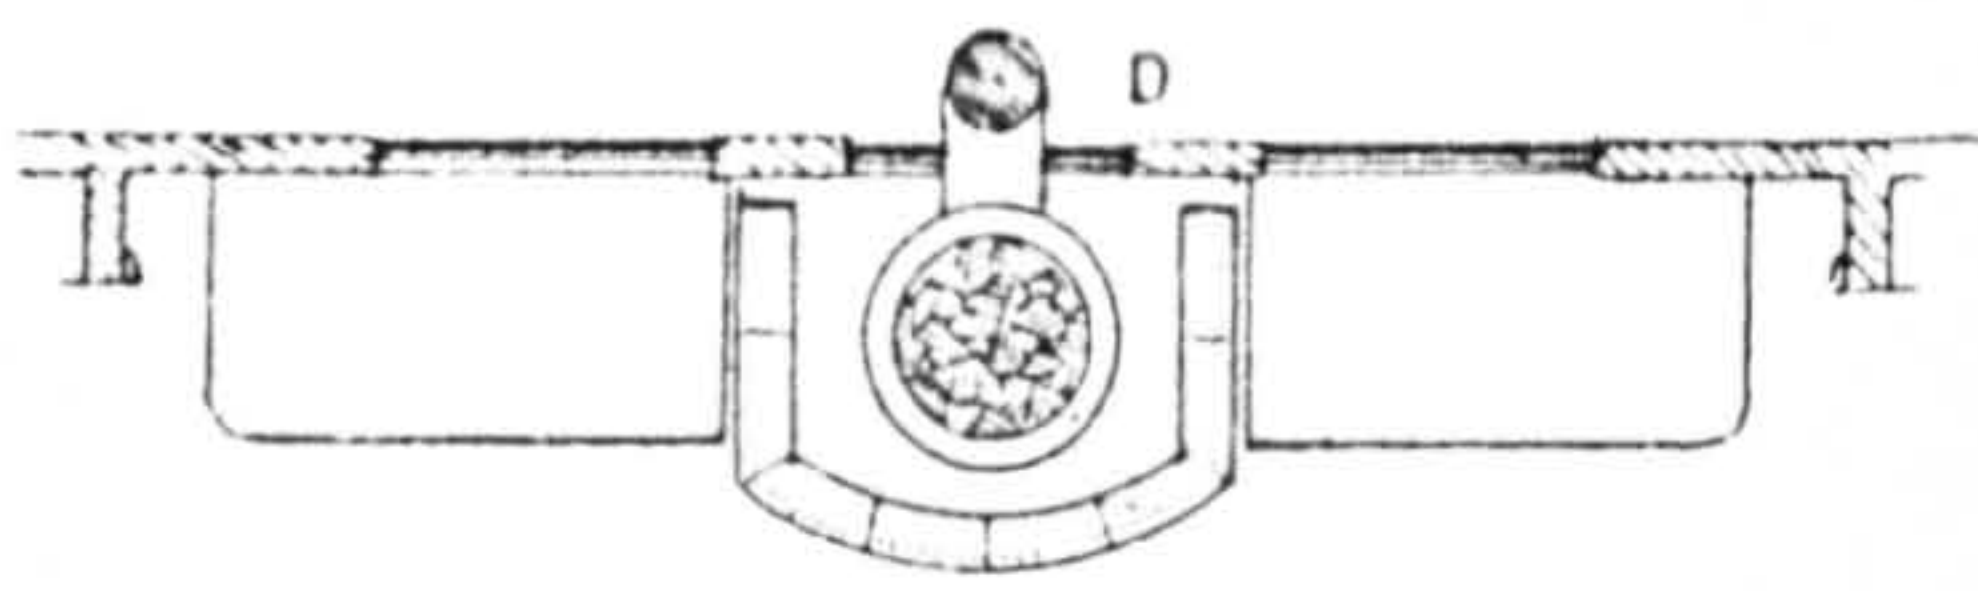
GENERAL PLAN. SEE ELEVATIONS A, B, C AND D.
